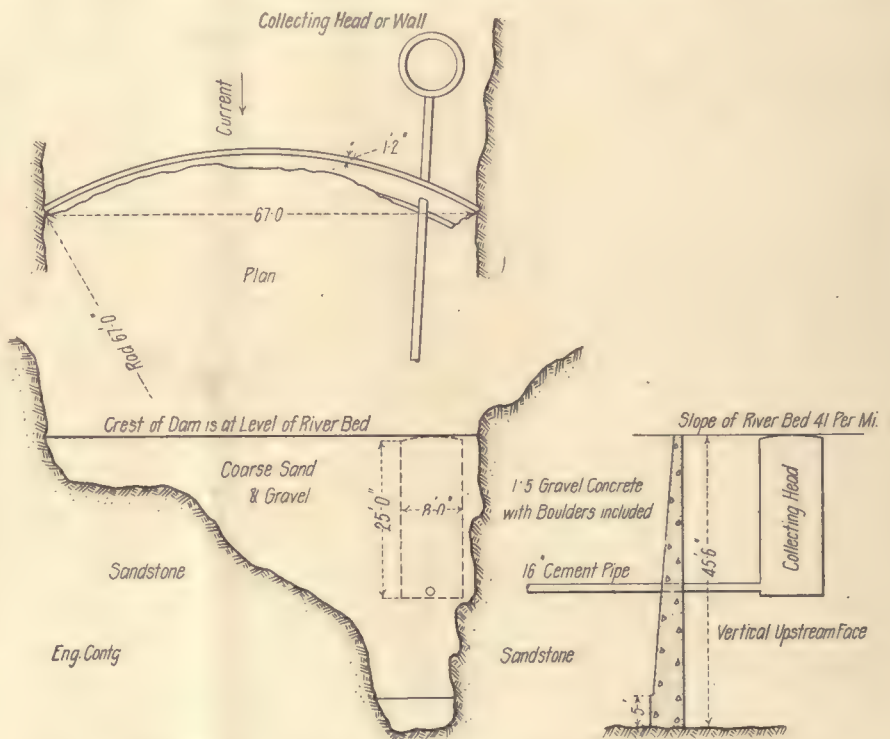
Plan Profile and Section of Sub-Surface Dam, Pantano, Wash., near Tucson, Ariz.
